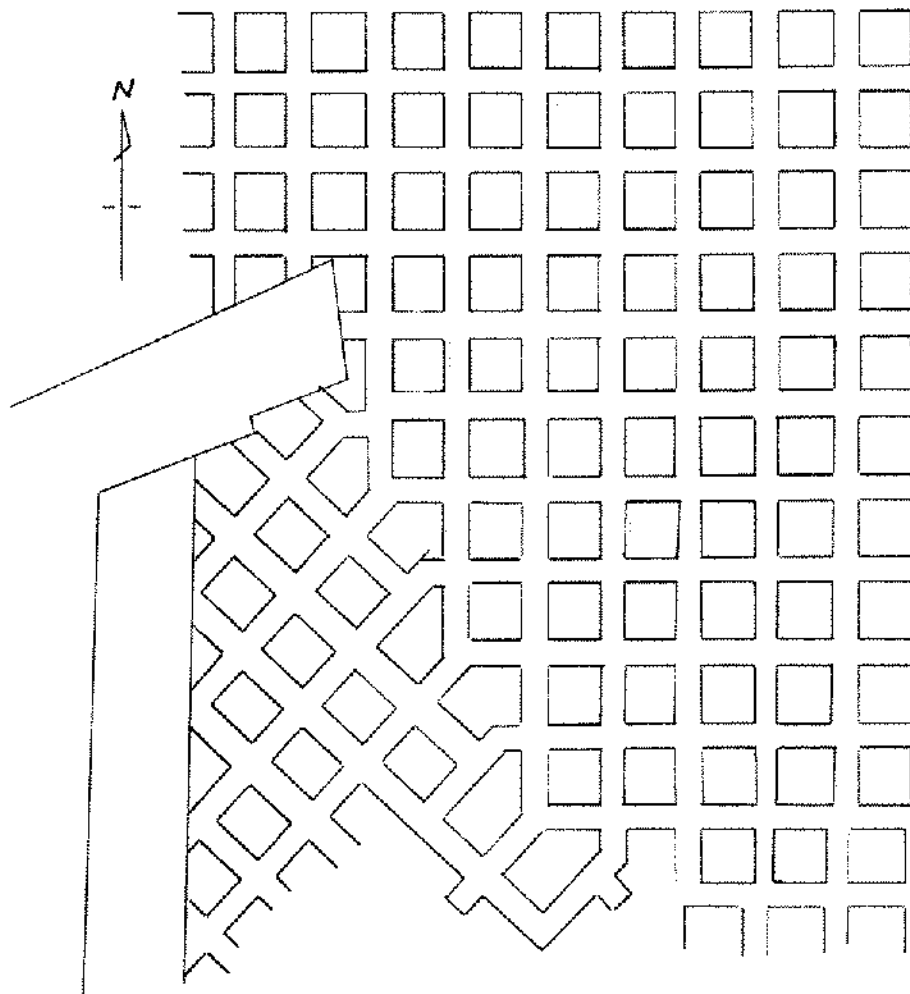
Test Panel Mining Layout, Fairport Mine, Morton Salt Company.
